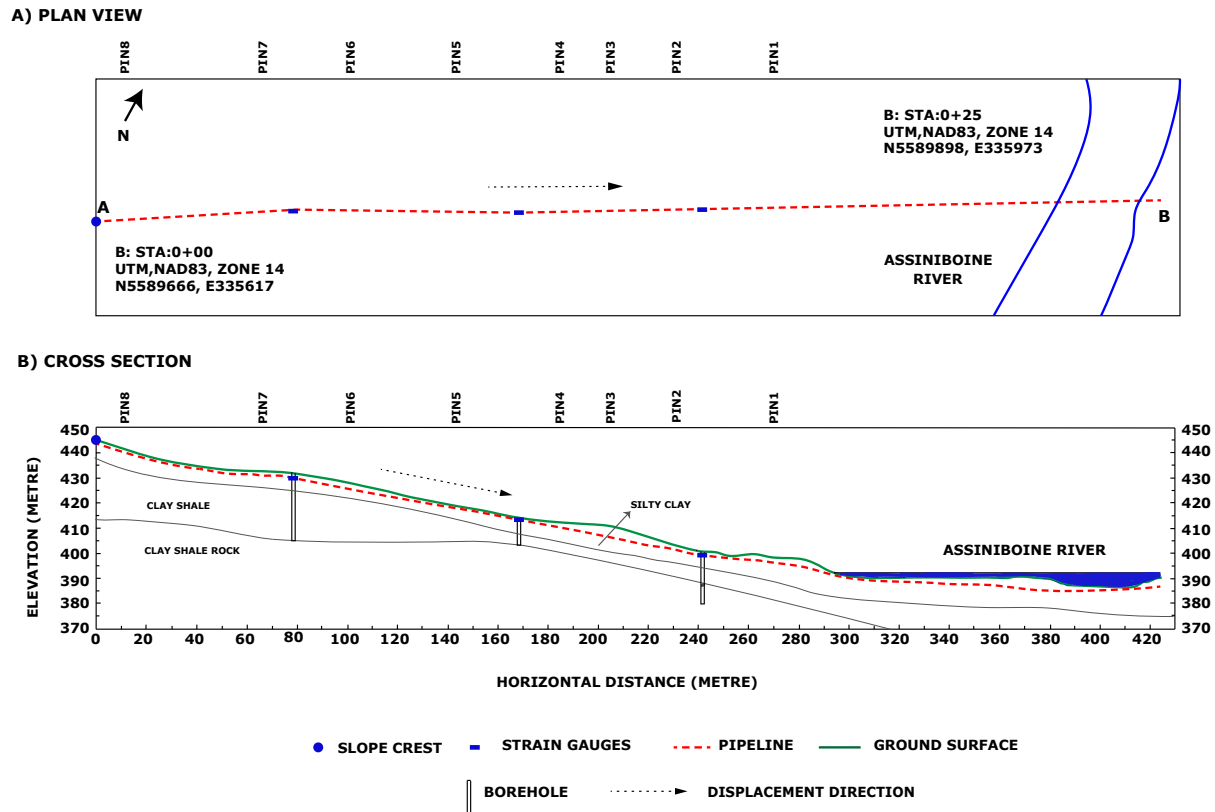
St-Lazare site plan and cross section (Ferreira, 2016).
